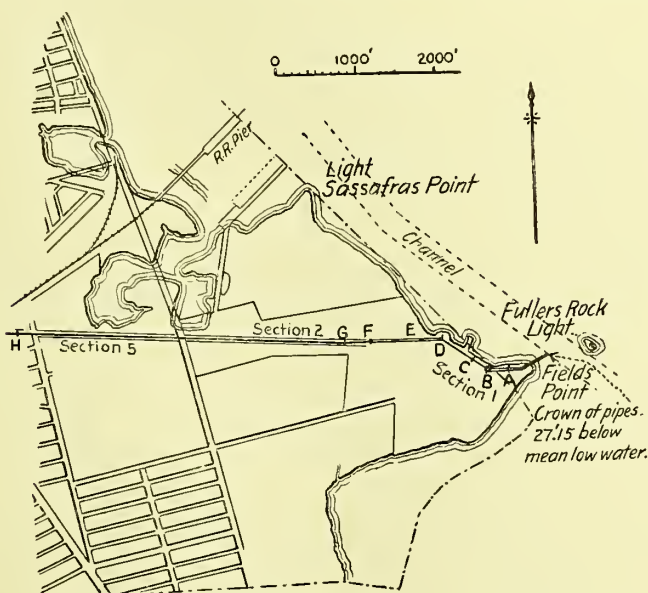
PLAN OF OUTLET SEWER TO FIELD'S POINT, PROVIDENCE, RHODE ISLAND.
